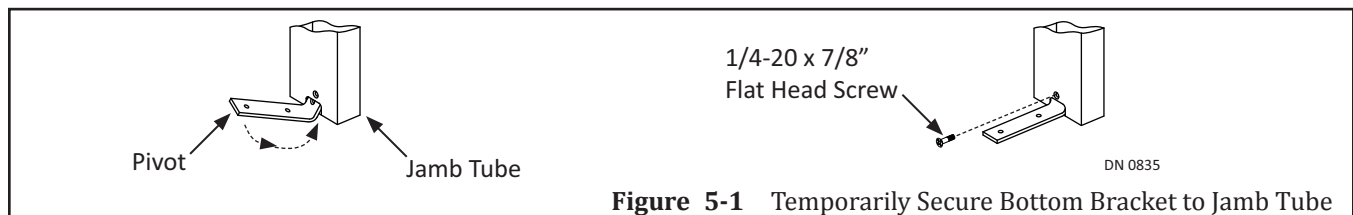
Temporarily Secure Bottom Bracket to Jamb Tube
